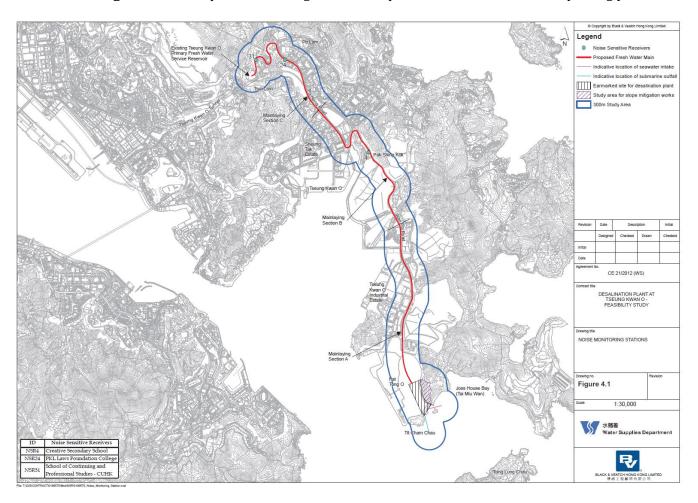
Site Layout Plan with Noise Sensitive Receivers and Desalination Plant
